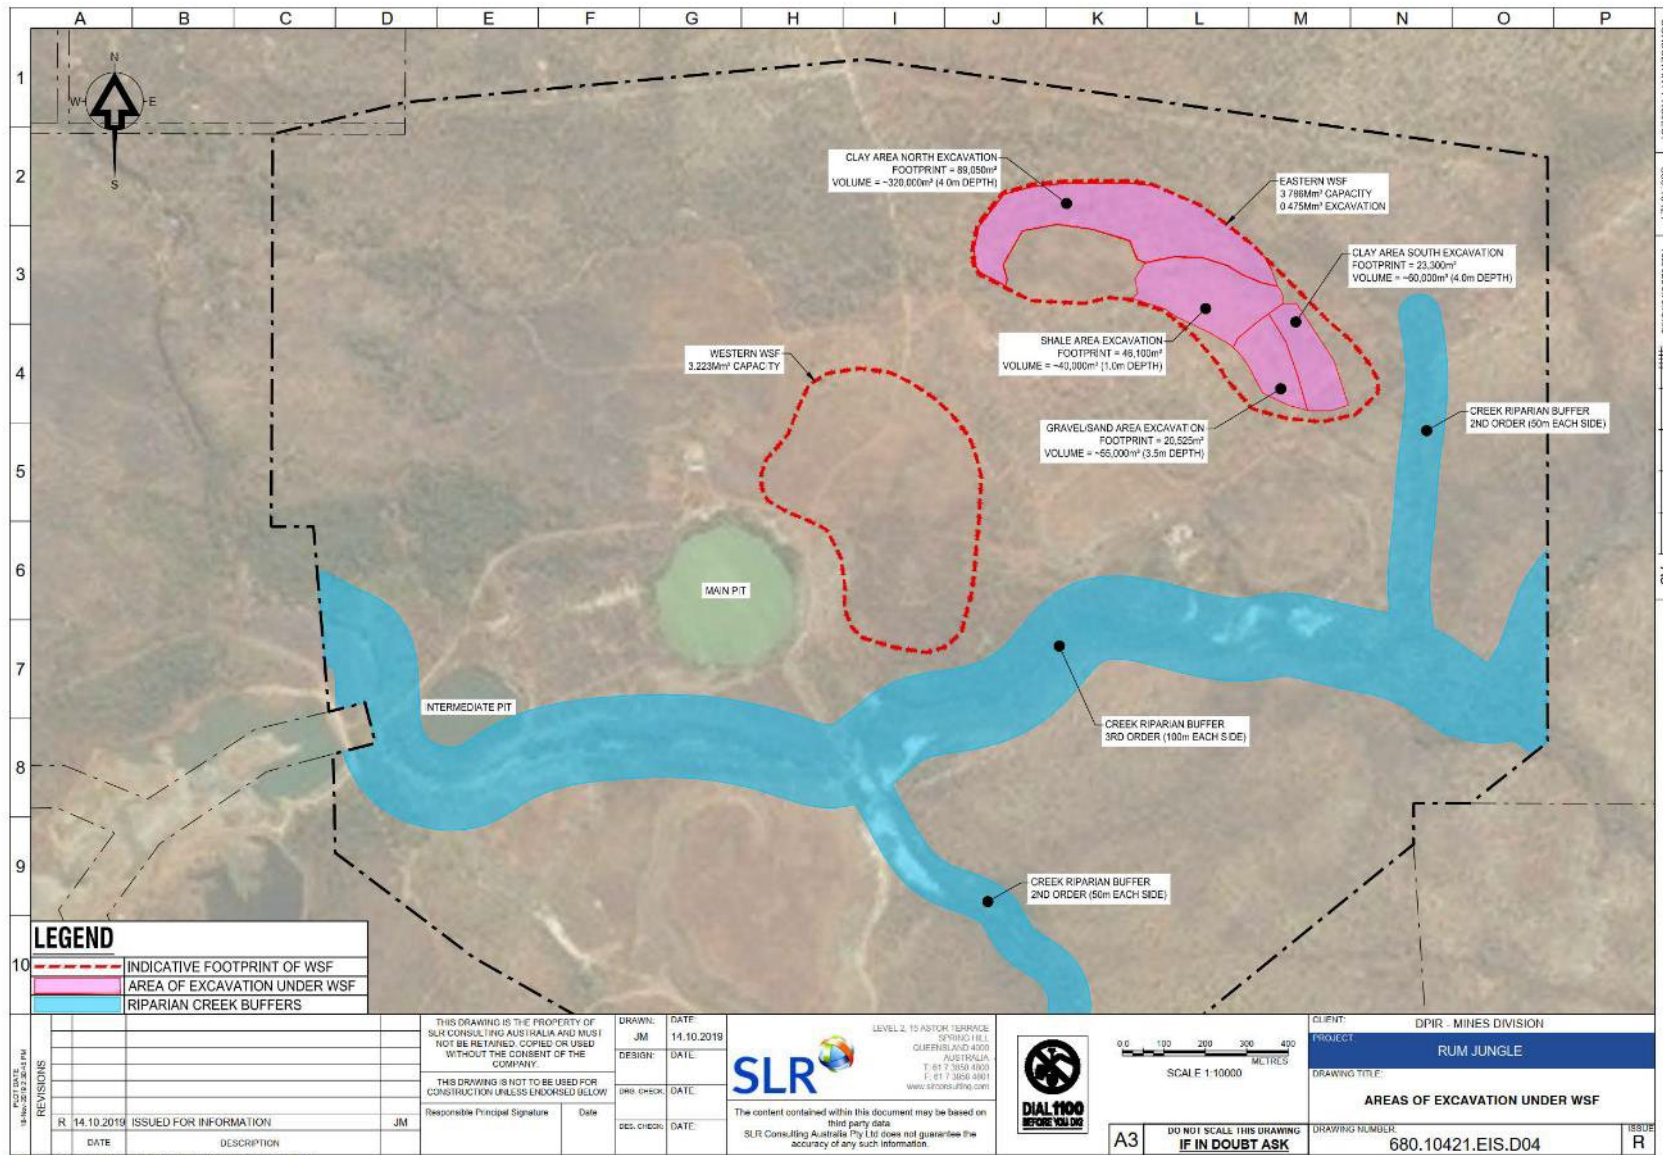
Areas of Excavation Under Waste Storage Facility (WSF)
